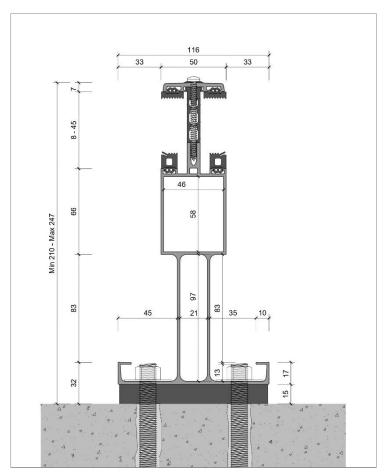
Cross-section of the BIPVT roof system with insulation panel [drawing created using AutoCAD]
